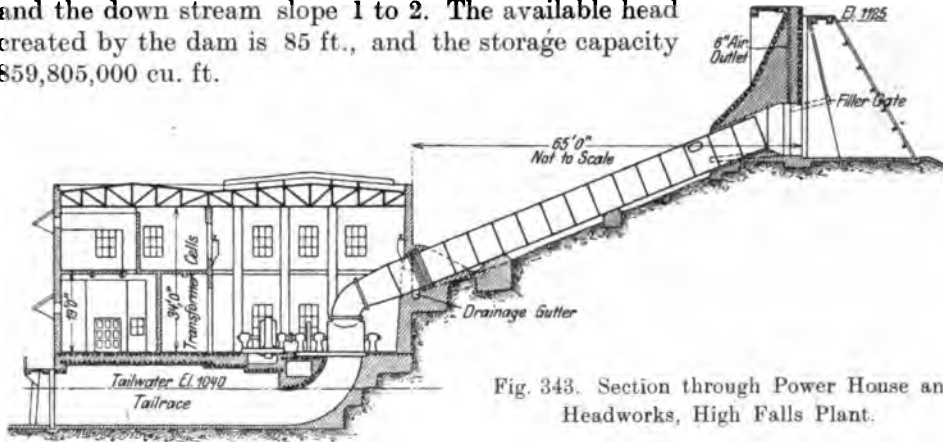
Section through Power House and Headworks, High Falls Plant.
